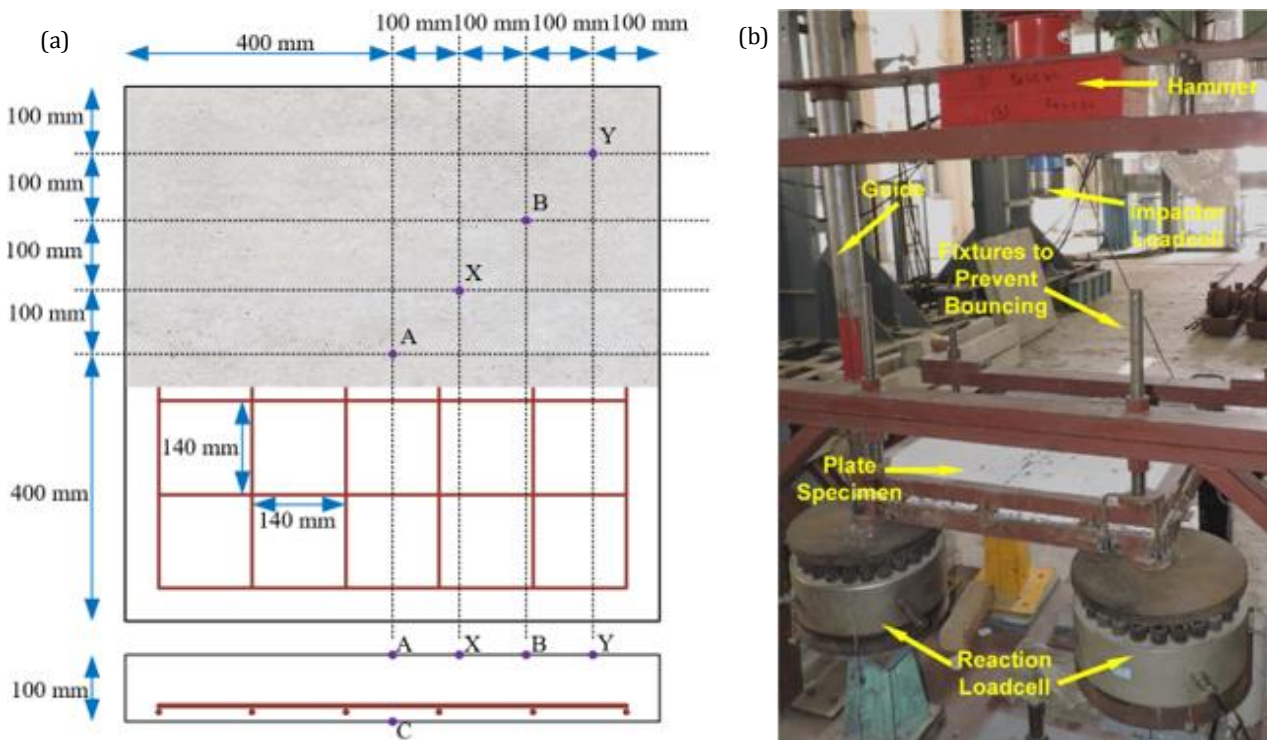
(a) The geometric dimensions and rebar details of the RC slabs; (b) Test setup.
